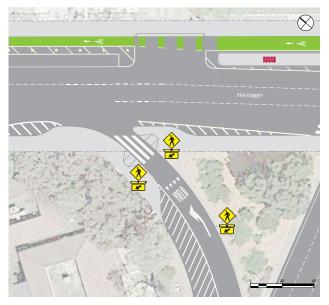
7th Street between Bryant and Harrison streets Improvement Plan
